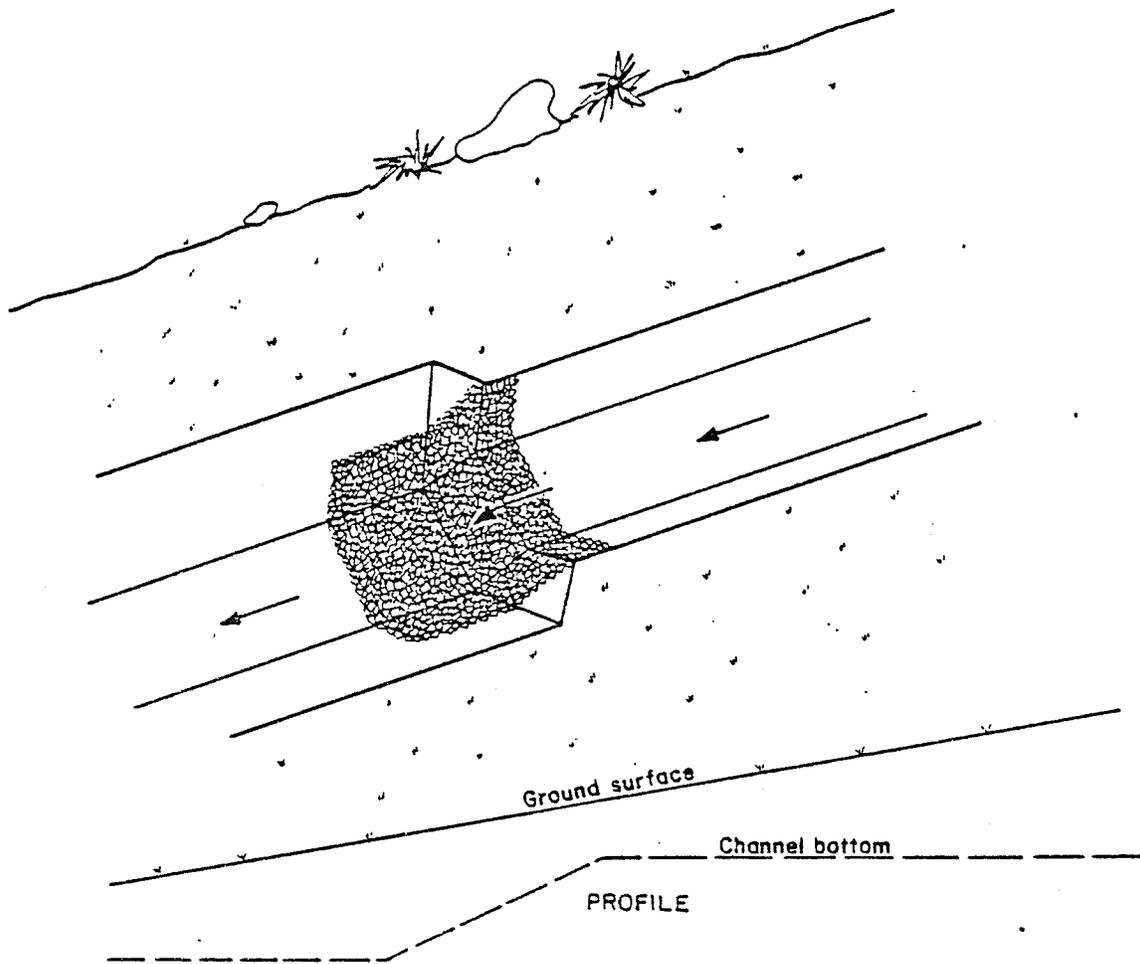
Definition sketch of a rock riprap drop structure (protection upstream and downstream according to Section 5.4).
